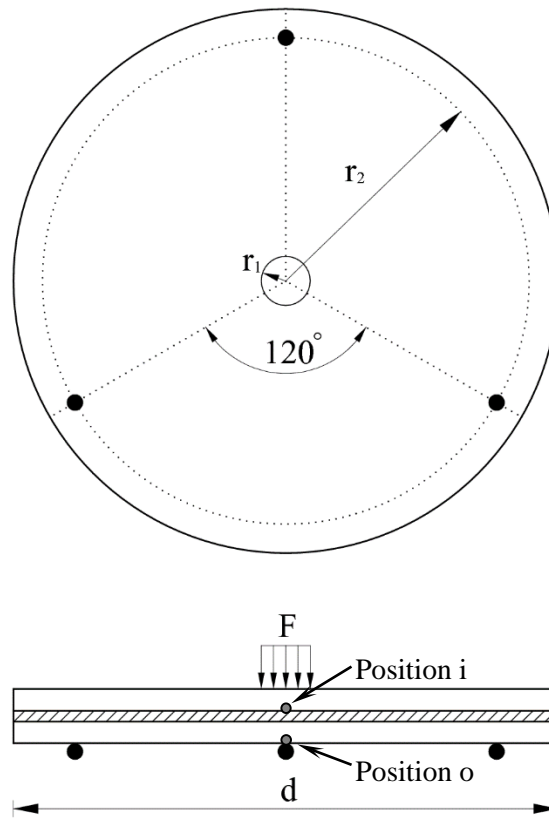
Schematic drawing of the biaxial bending tests on LG panels [31].
